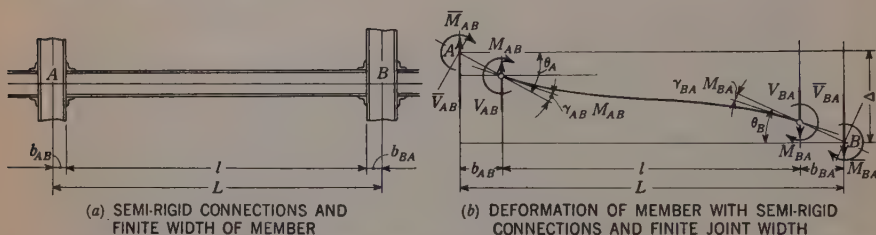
DEFORMATION OF MEMBER CONSIDERING SEMI-RIGID CONNECTIONS AND FINITE JOINT WIDTH
